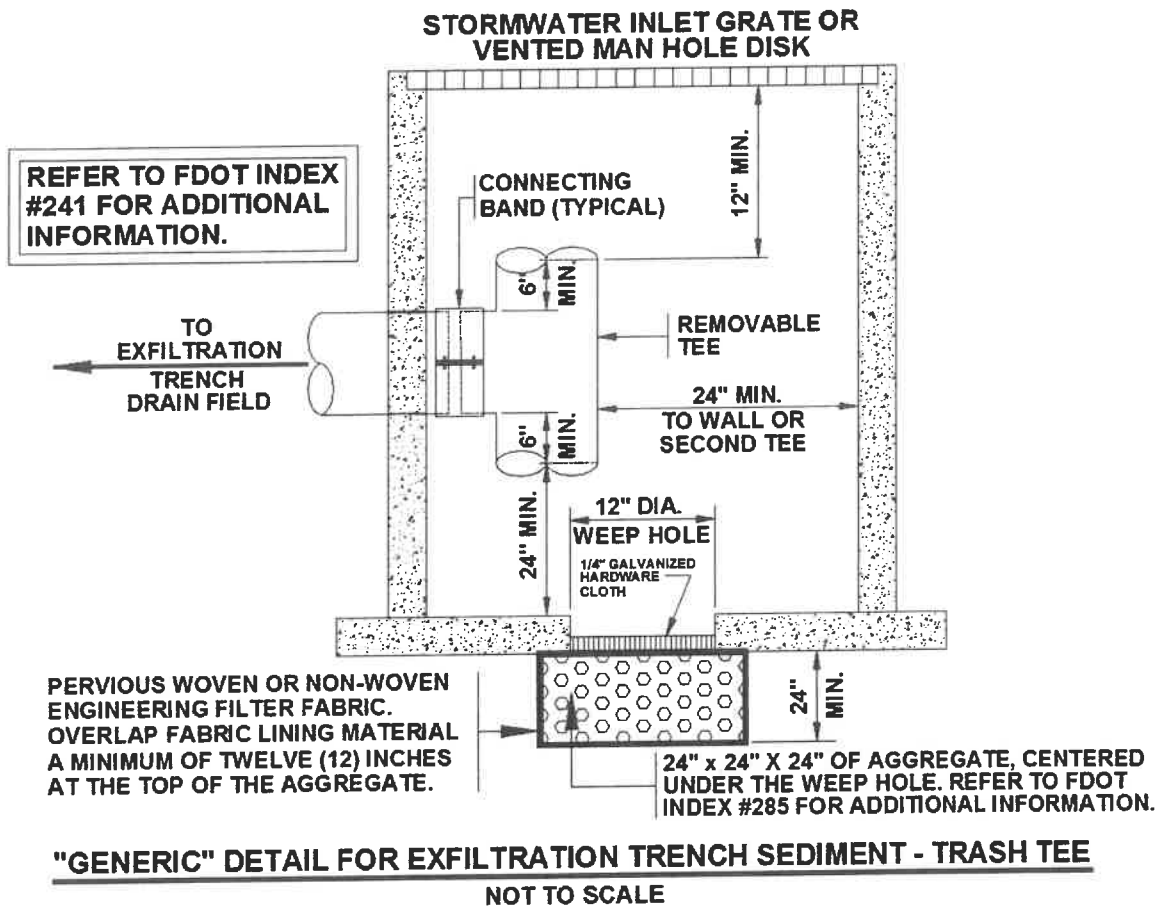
Generic Detail for a Typical Exfiltration Trench Trash Tee
